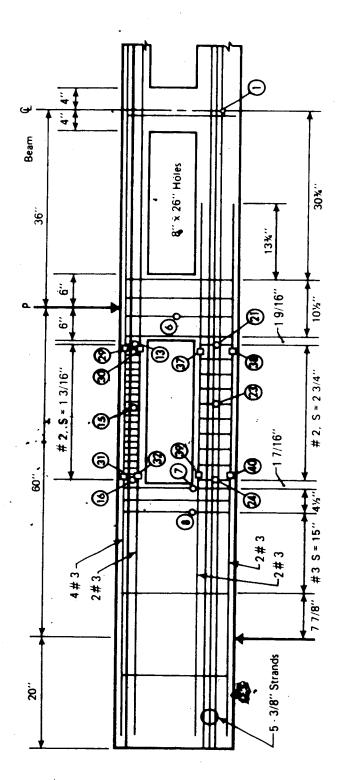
Reinforcement Details and Strain Gage Locations for Beam 22-26-5
